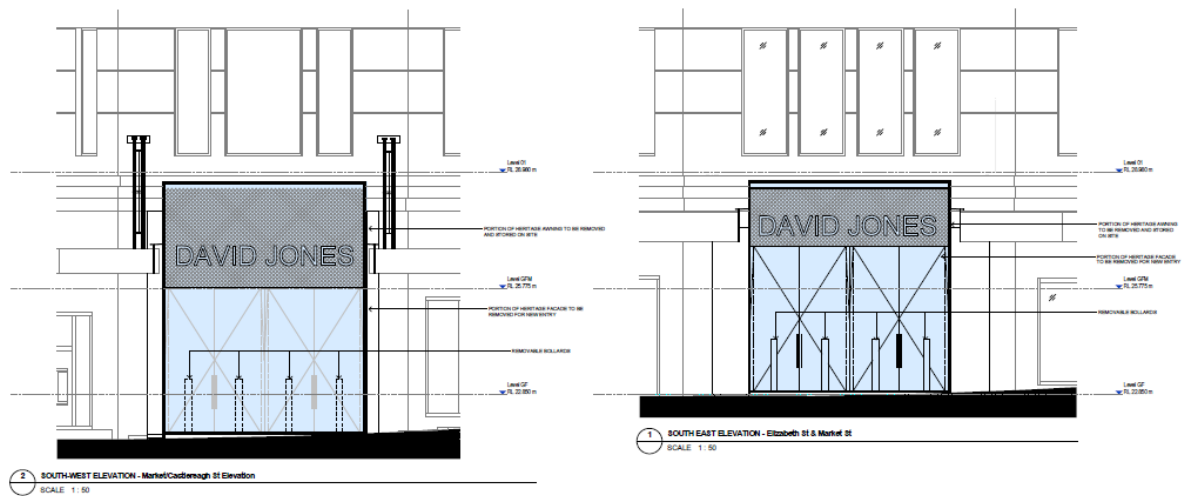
Proposed Market Street/Castlereagh Street and Market/Elizabeth Street corner entries
